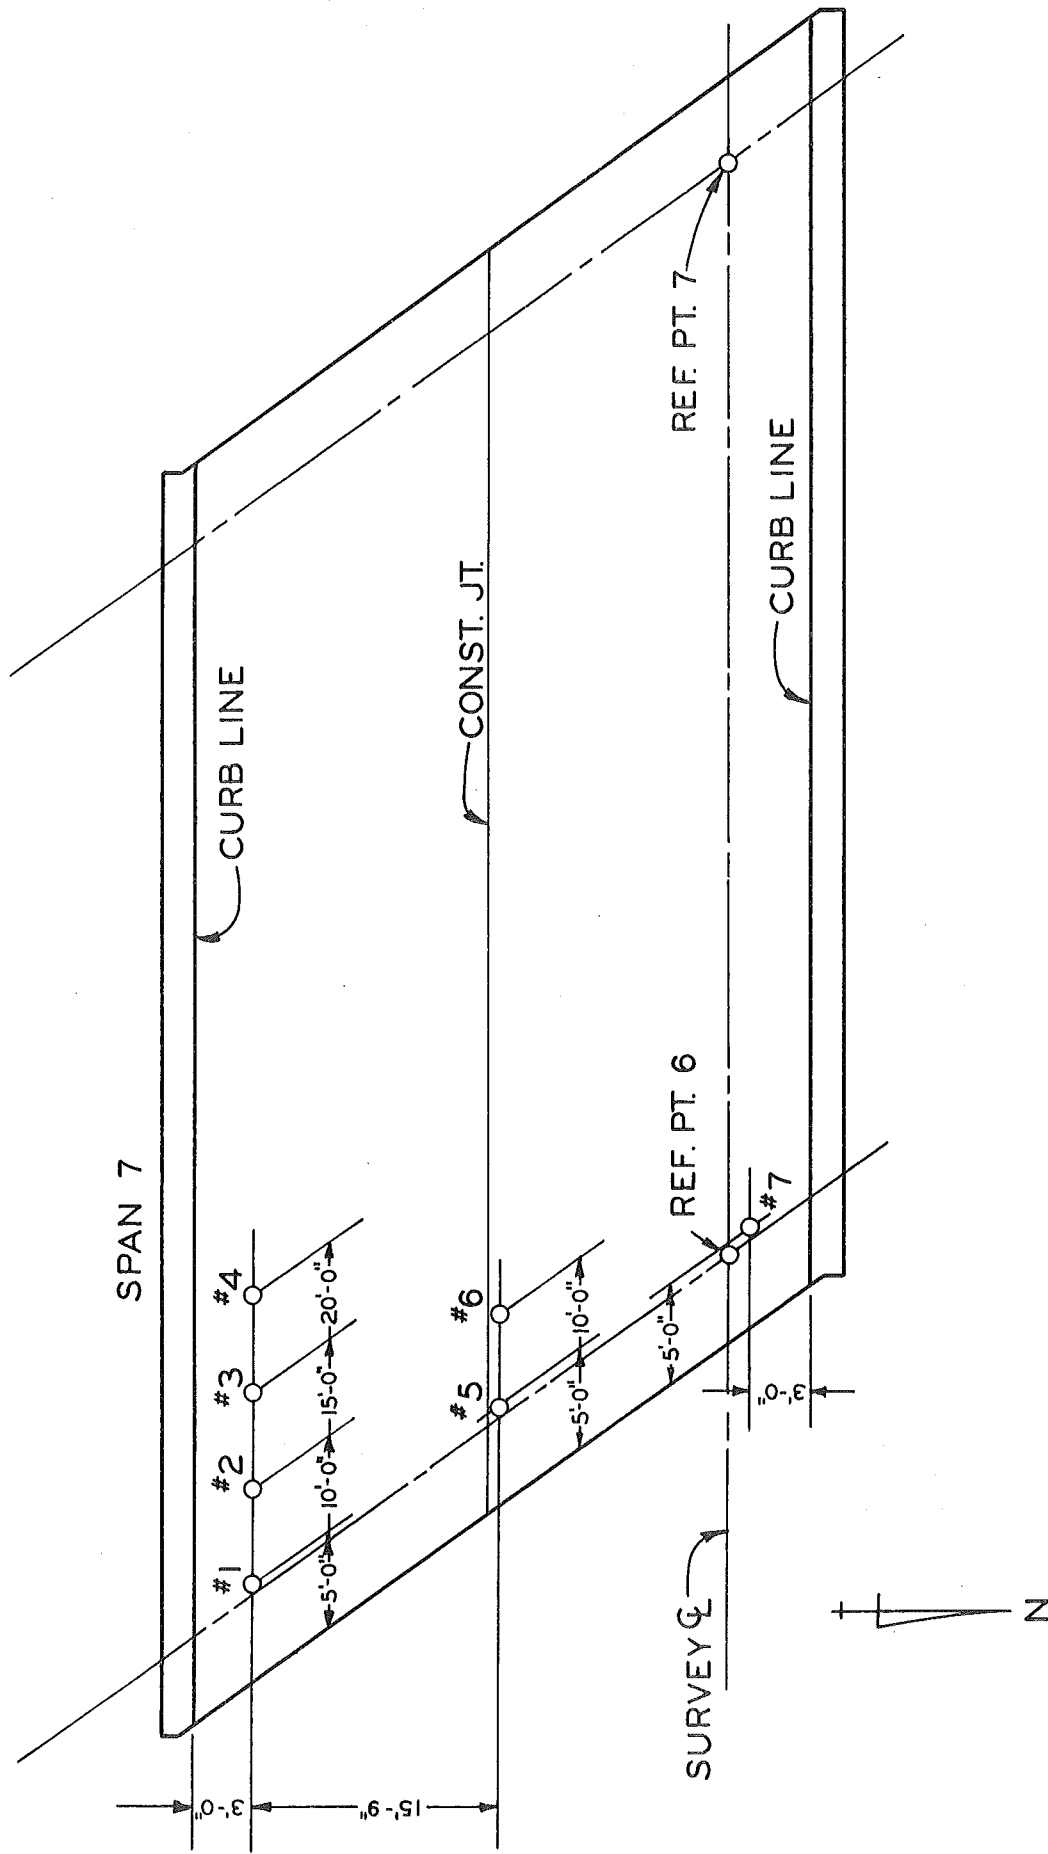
Core location plan X03 of 25042D (Ramp B over GTWRR and I 75).
